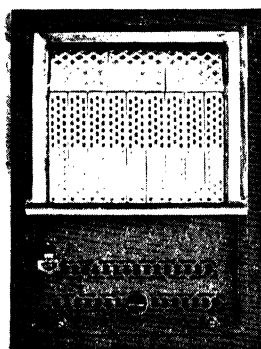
(b).—PANEL GAS FIRE FIXED IN THE WALL, ABOVE FLOOR LEVEL.
